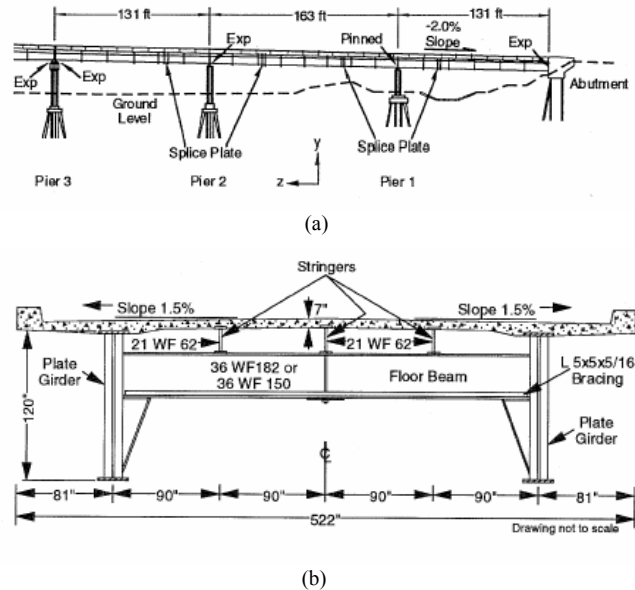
Bridge geometry (from [3]). (a) Elevation, (b) Cross-Section.
